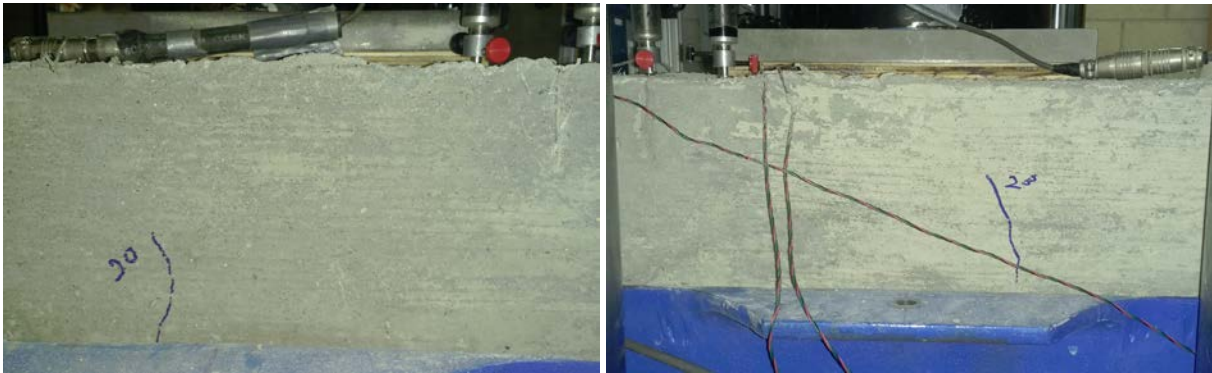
Cracking at the end region of the dowel bars (Specimen 3)
